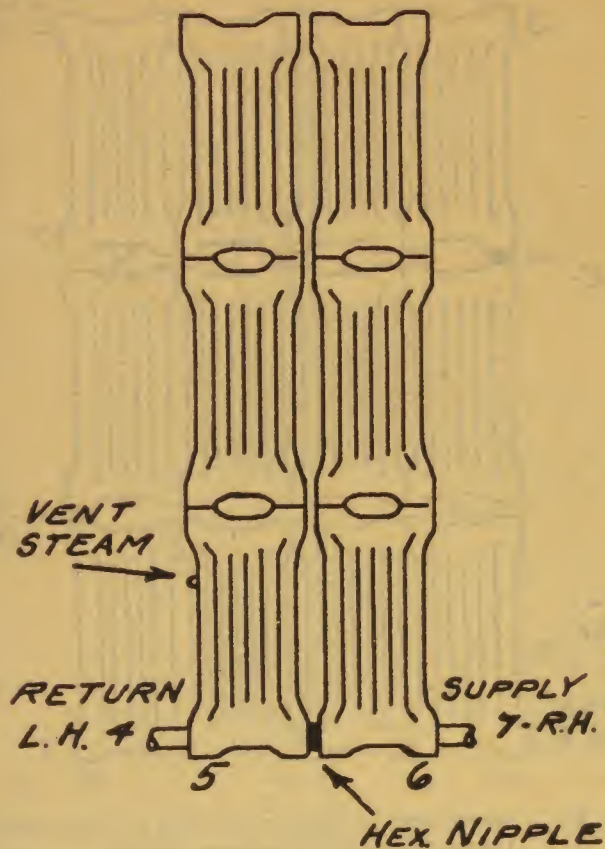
Assembled in two or more stacks. One and two pipe steam only. Bottom feed only.
